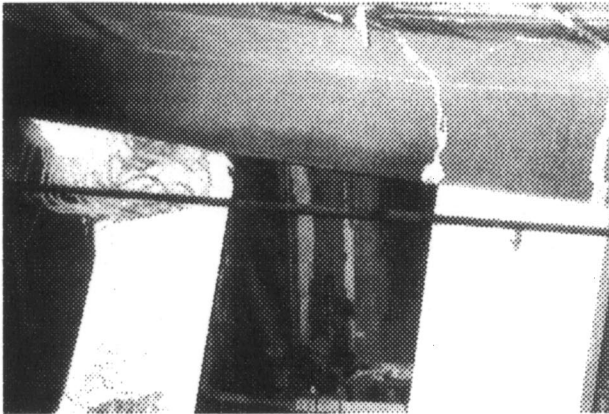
Shear collapse of center columns (the second pattern of collapse)
